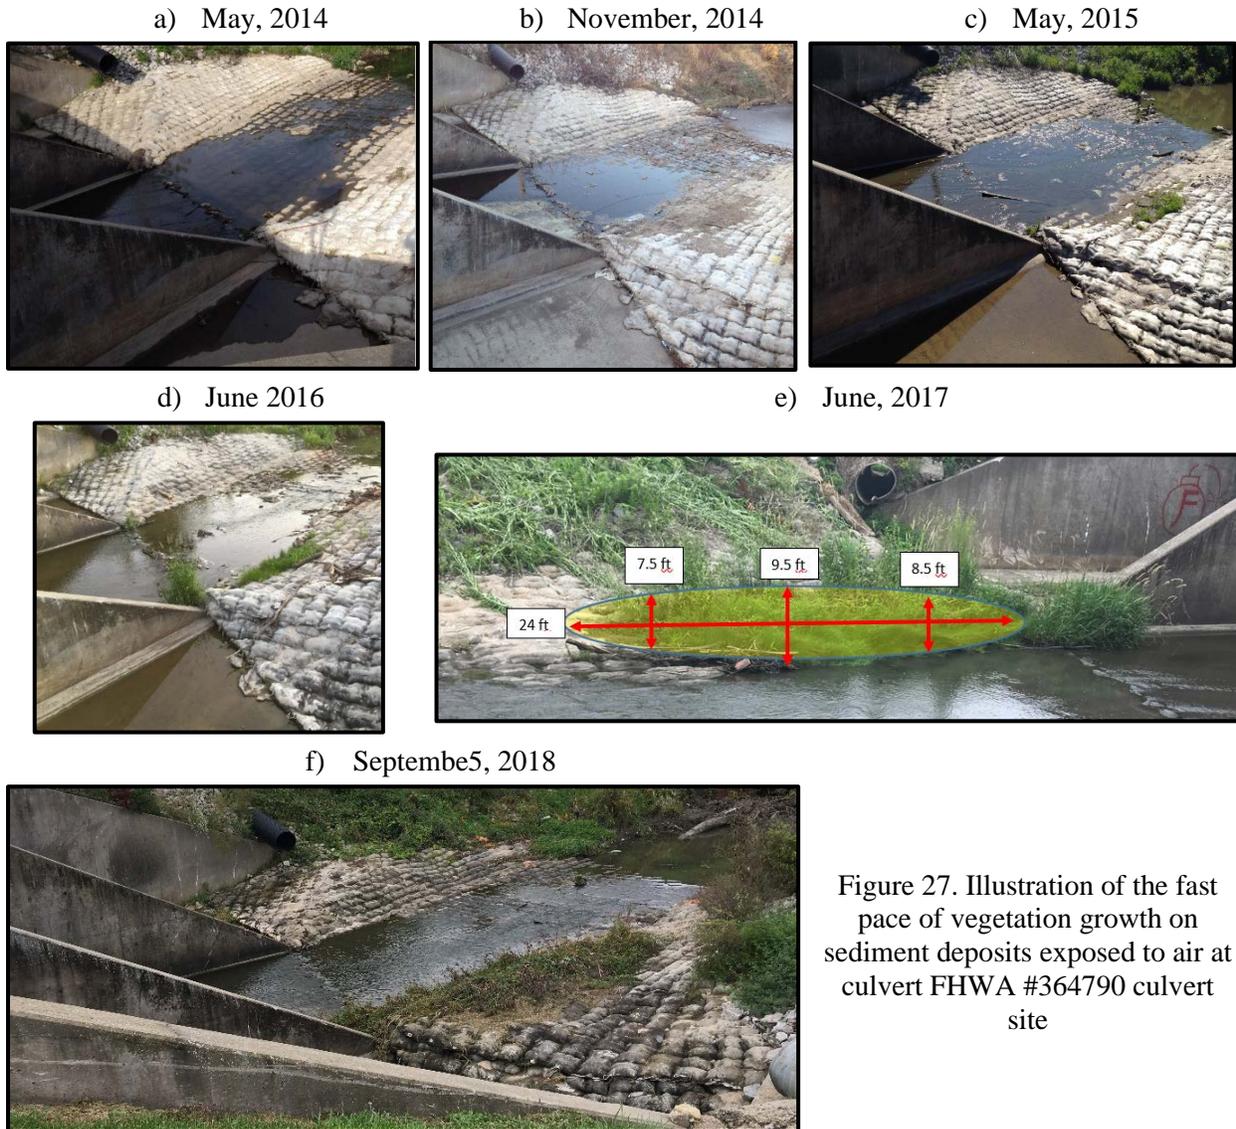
Illustration of the fast pace of vegetation growth on sediment deposits exposed to air at culvert FHWA #364790 culvert site
